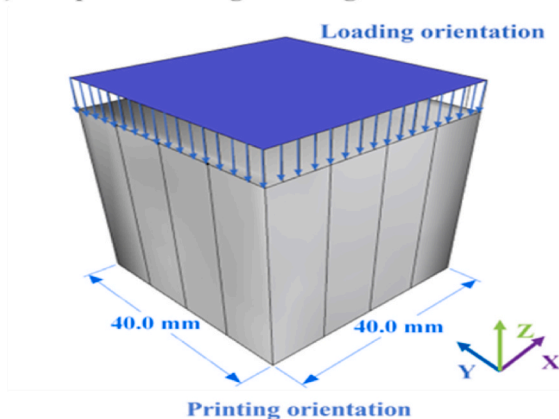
Loading methods for mechanical property testing of 3D printing specimens.
